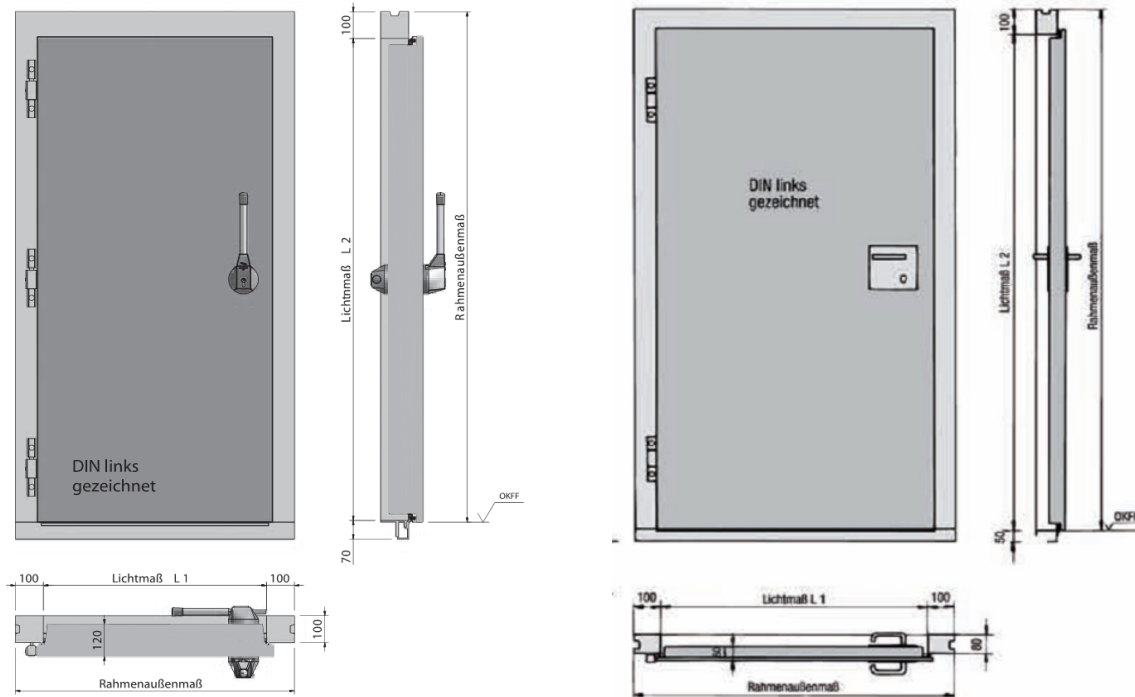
GT12 container door (left). BT6 separation wall door (right).
